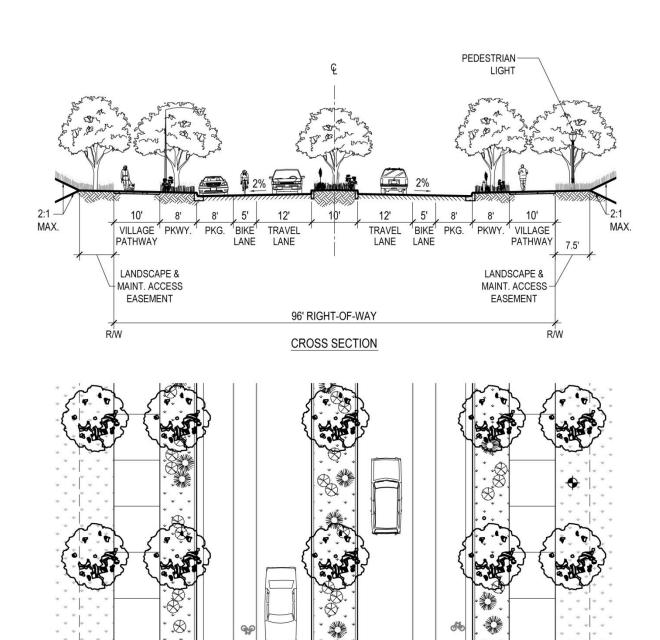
Modified 2-Lane Secondary Village Entry with Median and Village Pathway
